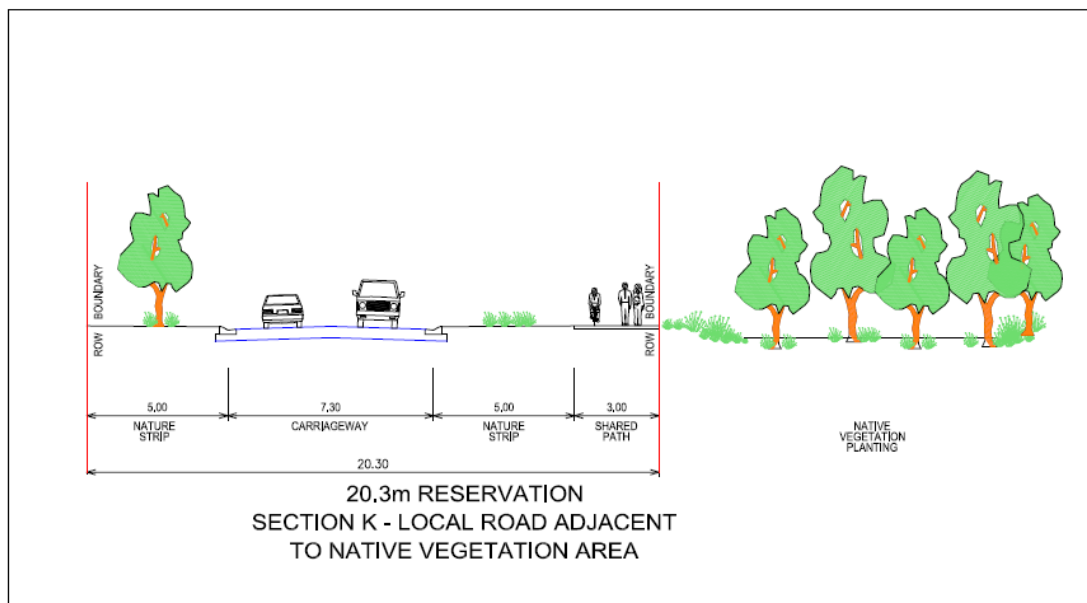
Section K – Local Road Adjacent to Native Vegetation Area
